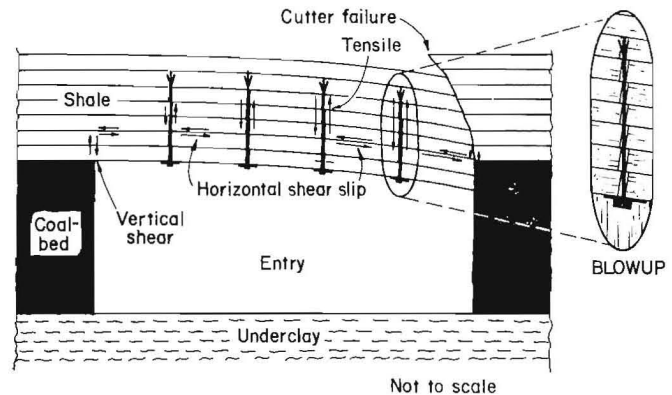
Schematic of forces in roof strata subject to cantilever beam failure.
